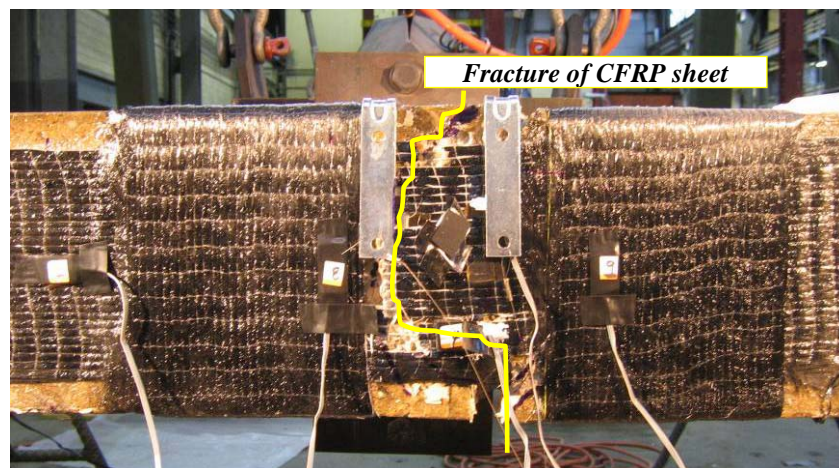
Failure of A-BF-U-5S, fracture of CFRP sheet
